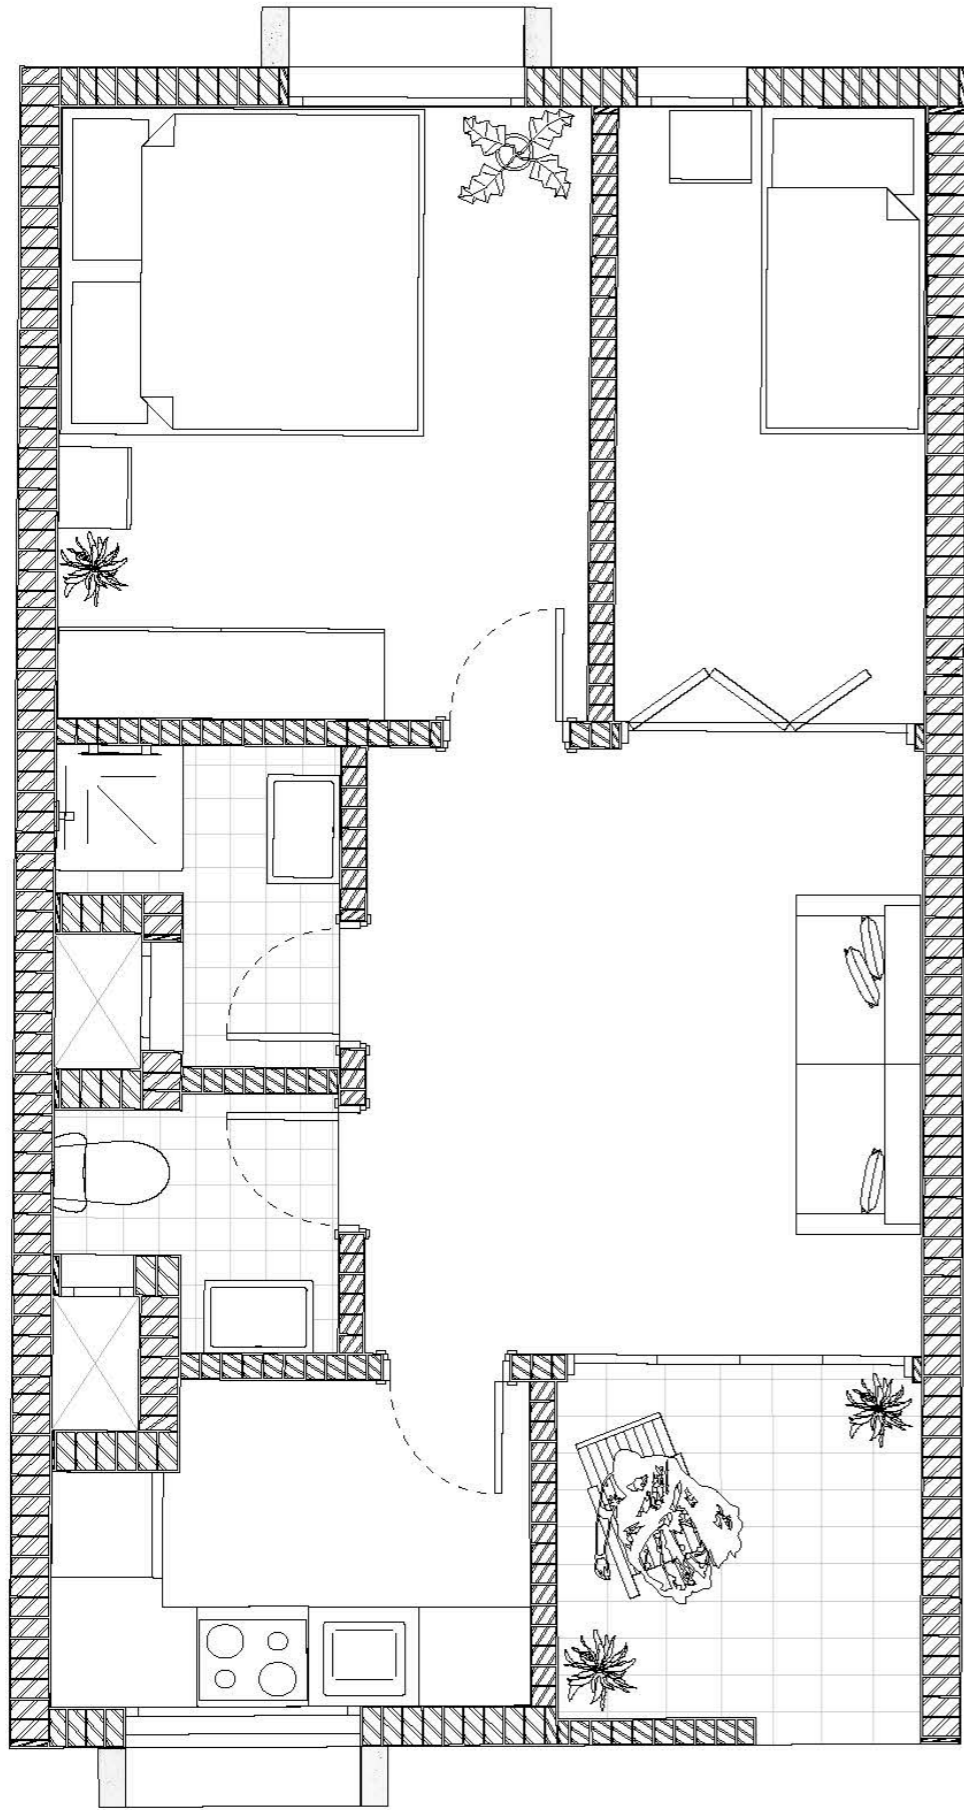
, Groundfloor cluster plan (author's work, 2026)
